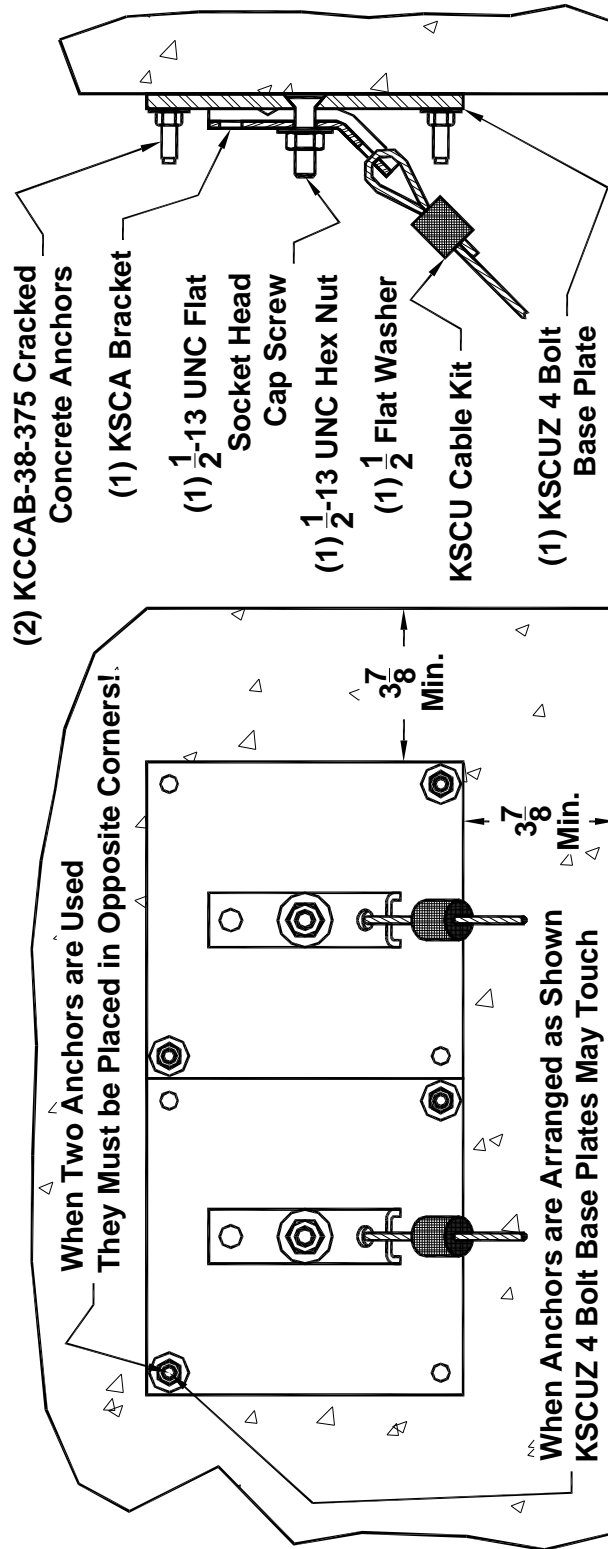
; Model KSCUZ2 Attachment Kit to Concrete Using the KSCA Bracket – (2) 3/8 Anchors
